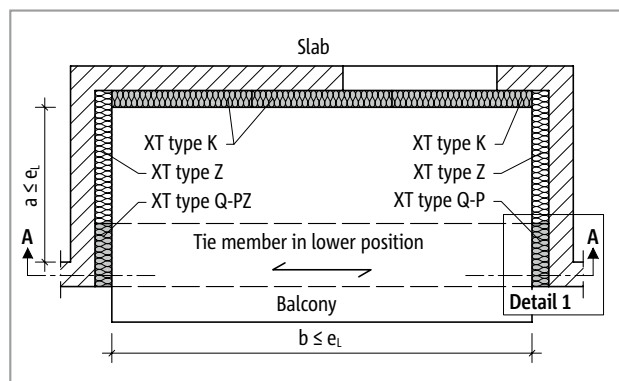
Schöck Isokorb® XT type Q-PZ, Q-P: Plan view recessed balcony
